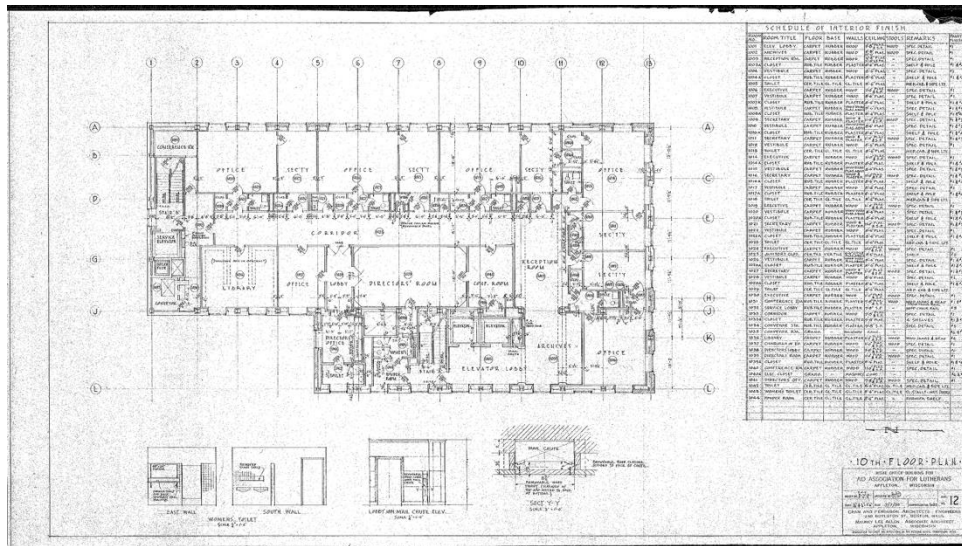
AAL Building, proposed 10th floor plan (executive office floor plan), as completed in 1966 with new addition at bottom. Executive offices are mostly demolished. Source: 1964 drawing set, owner's collection.
